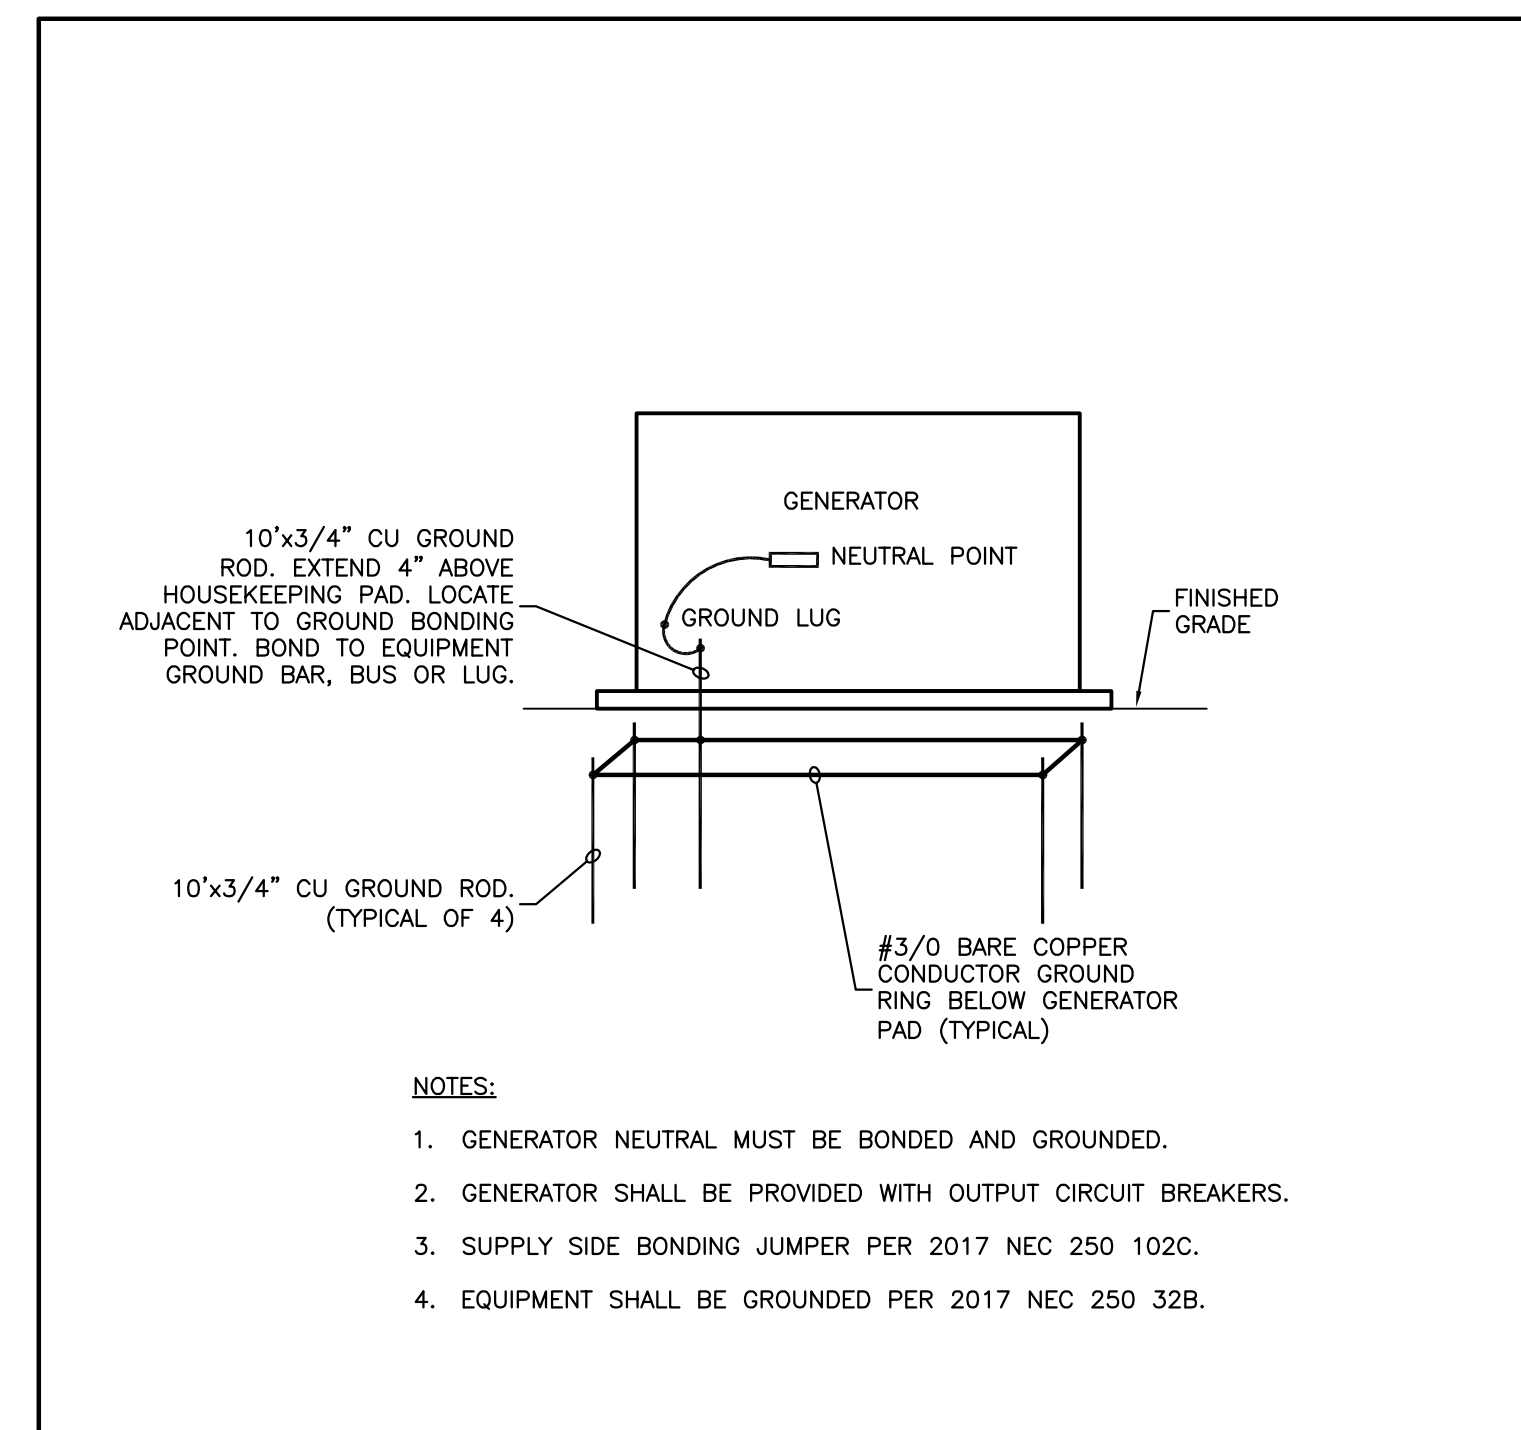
DETAIL SERVICE EQUIPMENT GROUNDING DETAIL
